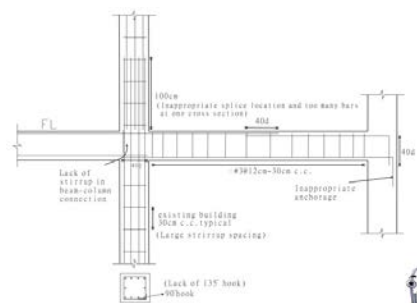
Critical Structural Details - RC Frame Reinforcement Details
